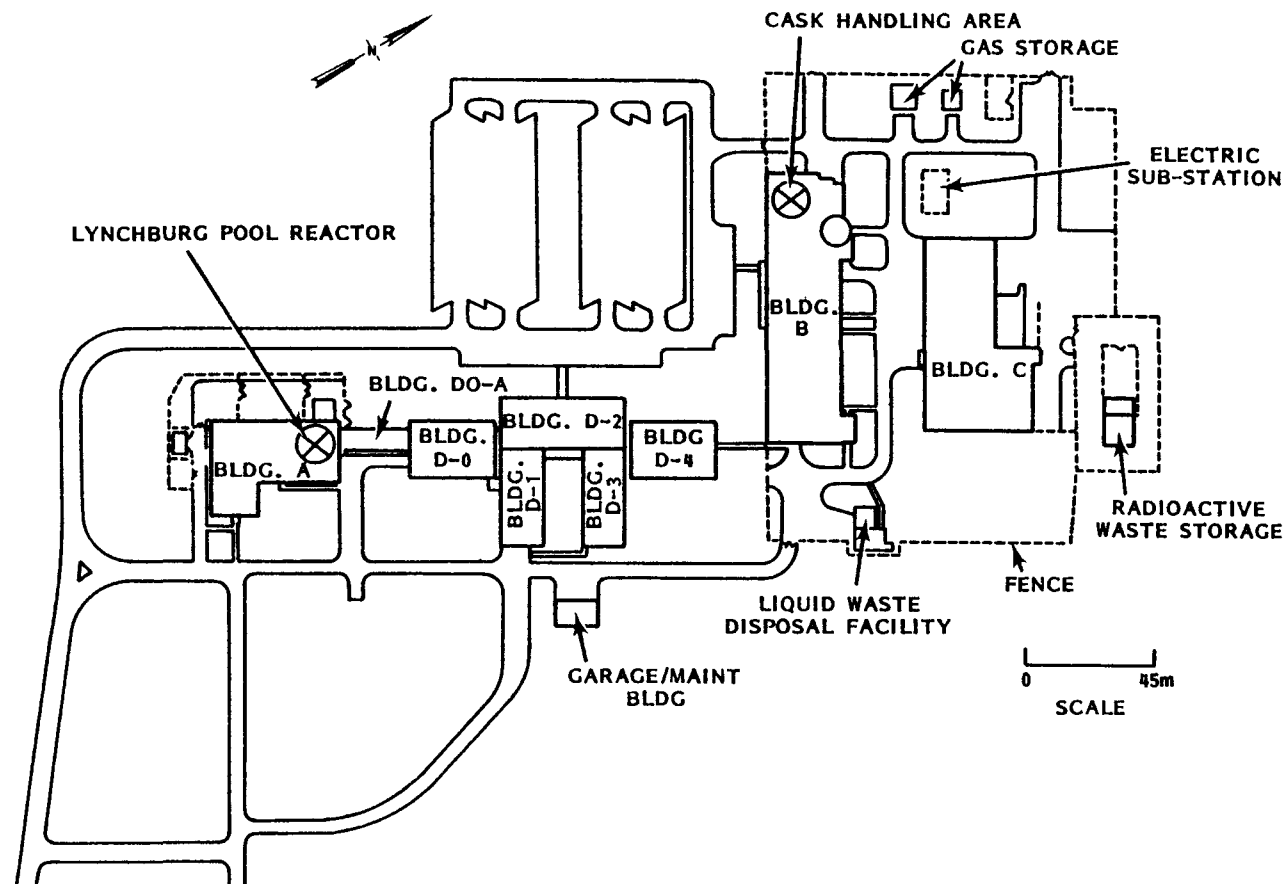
Site Plan of the Lynchburg Research Center
